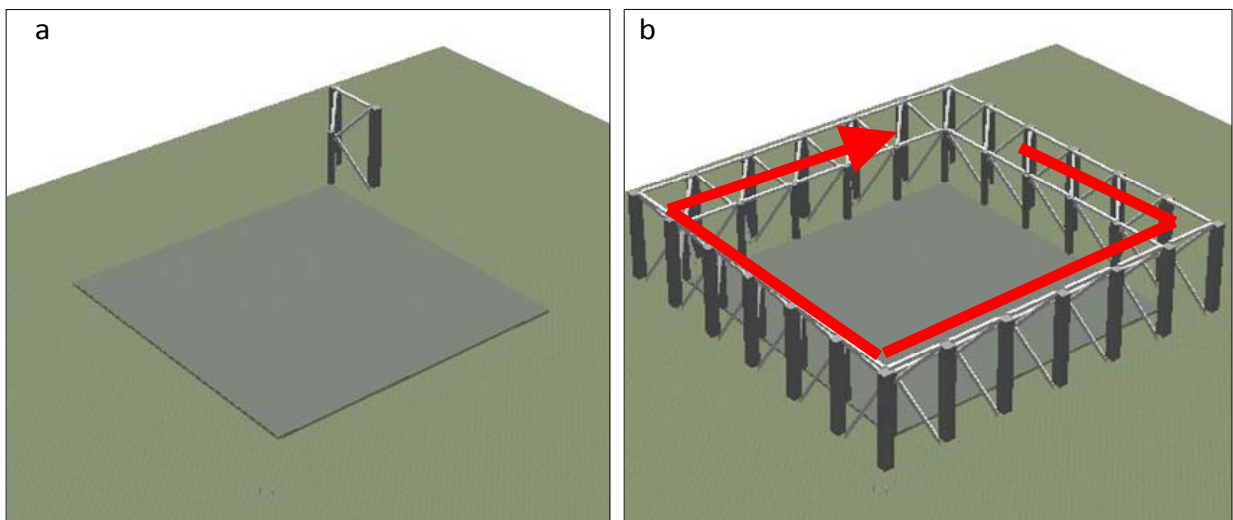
(a) The first step construction: forming the first module; (b) Completion of the ground floor structure
